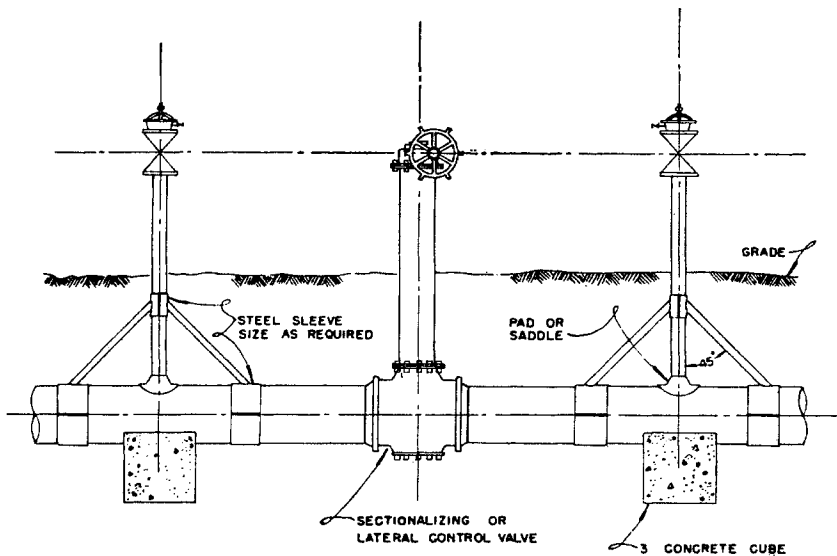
Typical line-valve and blowoff-valve assembly.
